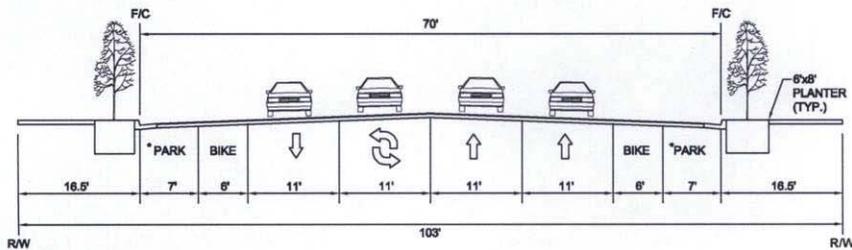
Railyards Boulevard - west of 7th Street (looking west)
